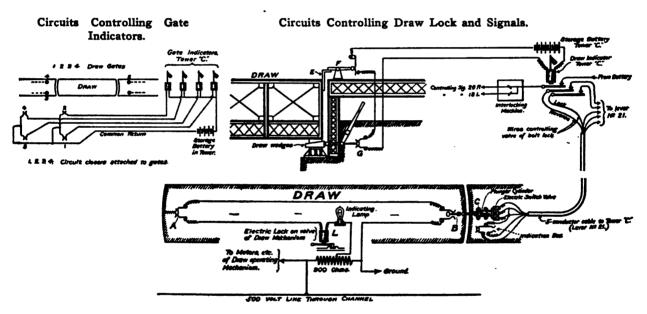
Circuits for Drawbridge Protection. Boston Elevated Railroad.
